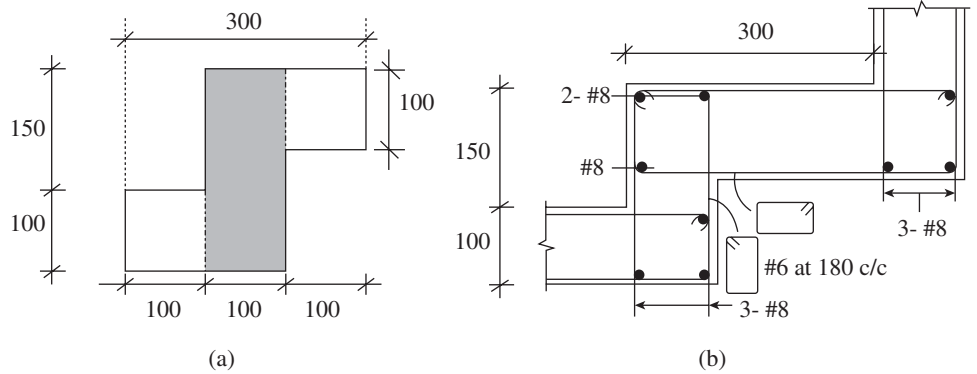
Tread-riser stair of Example 17.2 (a) Typical unit (b) Detailing
